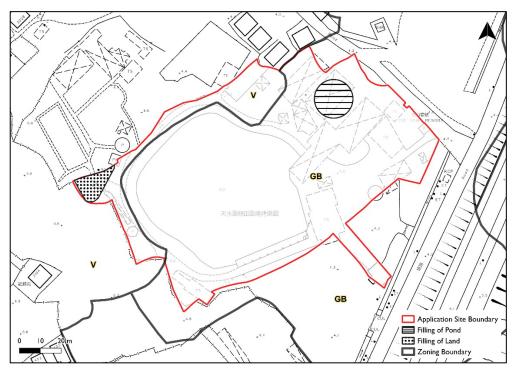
Location of Filling of Land and Pond Carried Out in Previous Planning Approval (i.e. A/YL-LFS/424)
